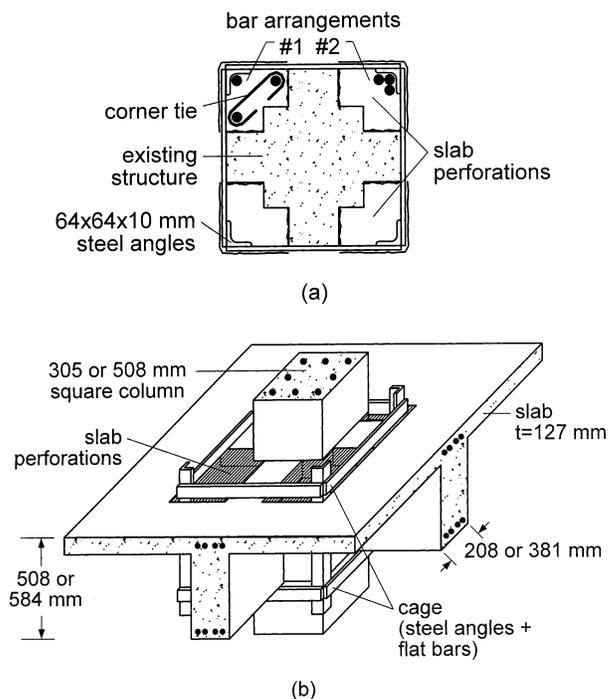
Concrete jacketing technique studied by Alcocer and Jirsa:¹⁷ (a) plan, and (b) perspective.
